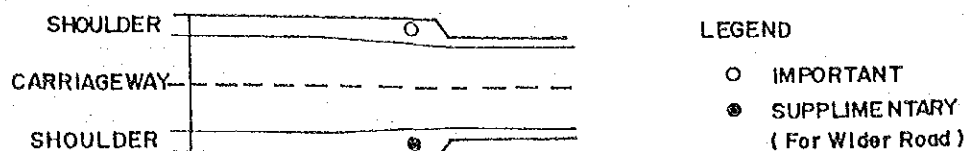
Typical Luminaire Arrangement (Width Transition)
